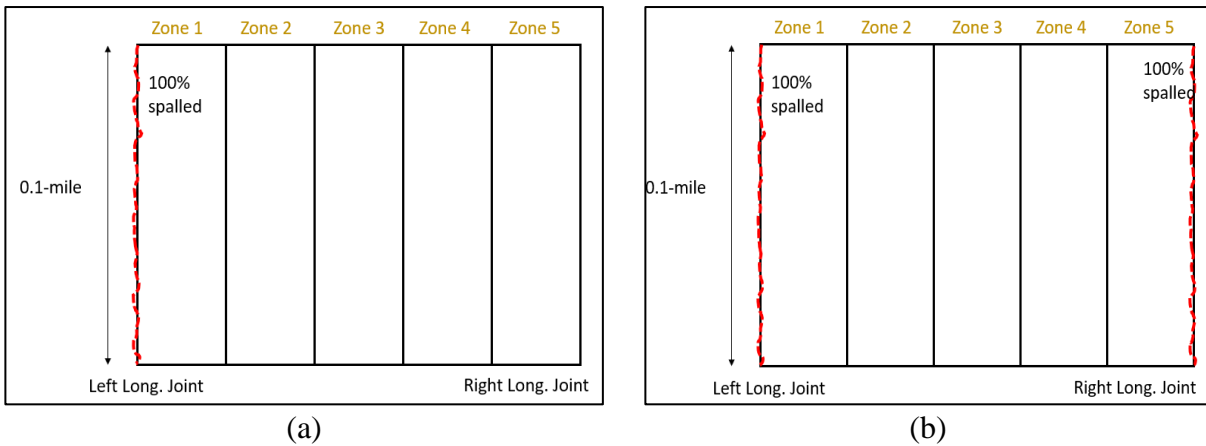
Longitudinal joint spalling scenarios (a) 50% spalled and (b) 100% spalled for a 0.1-mile interval segment
